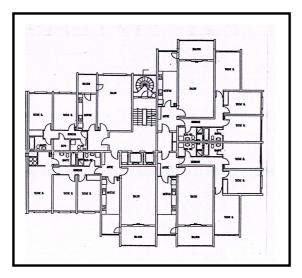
Typical plan of Pamukkale & Selçuk Apartment Building
